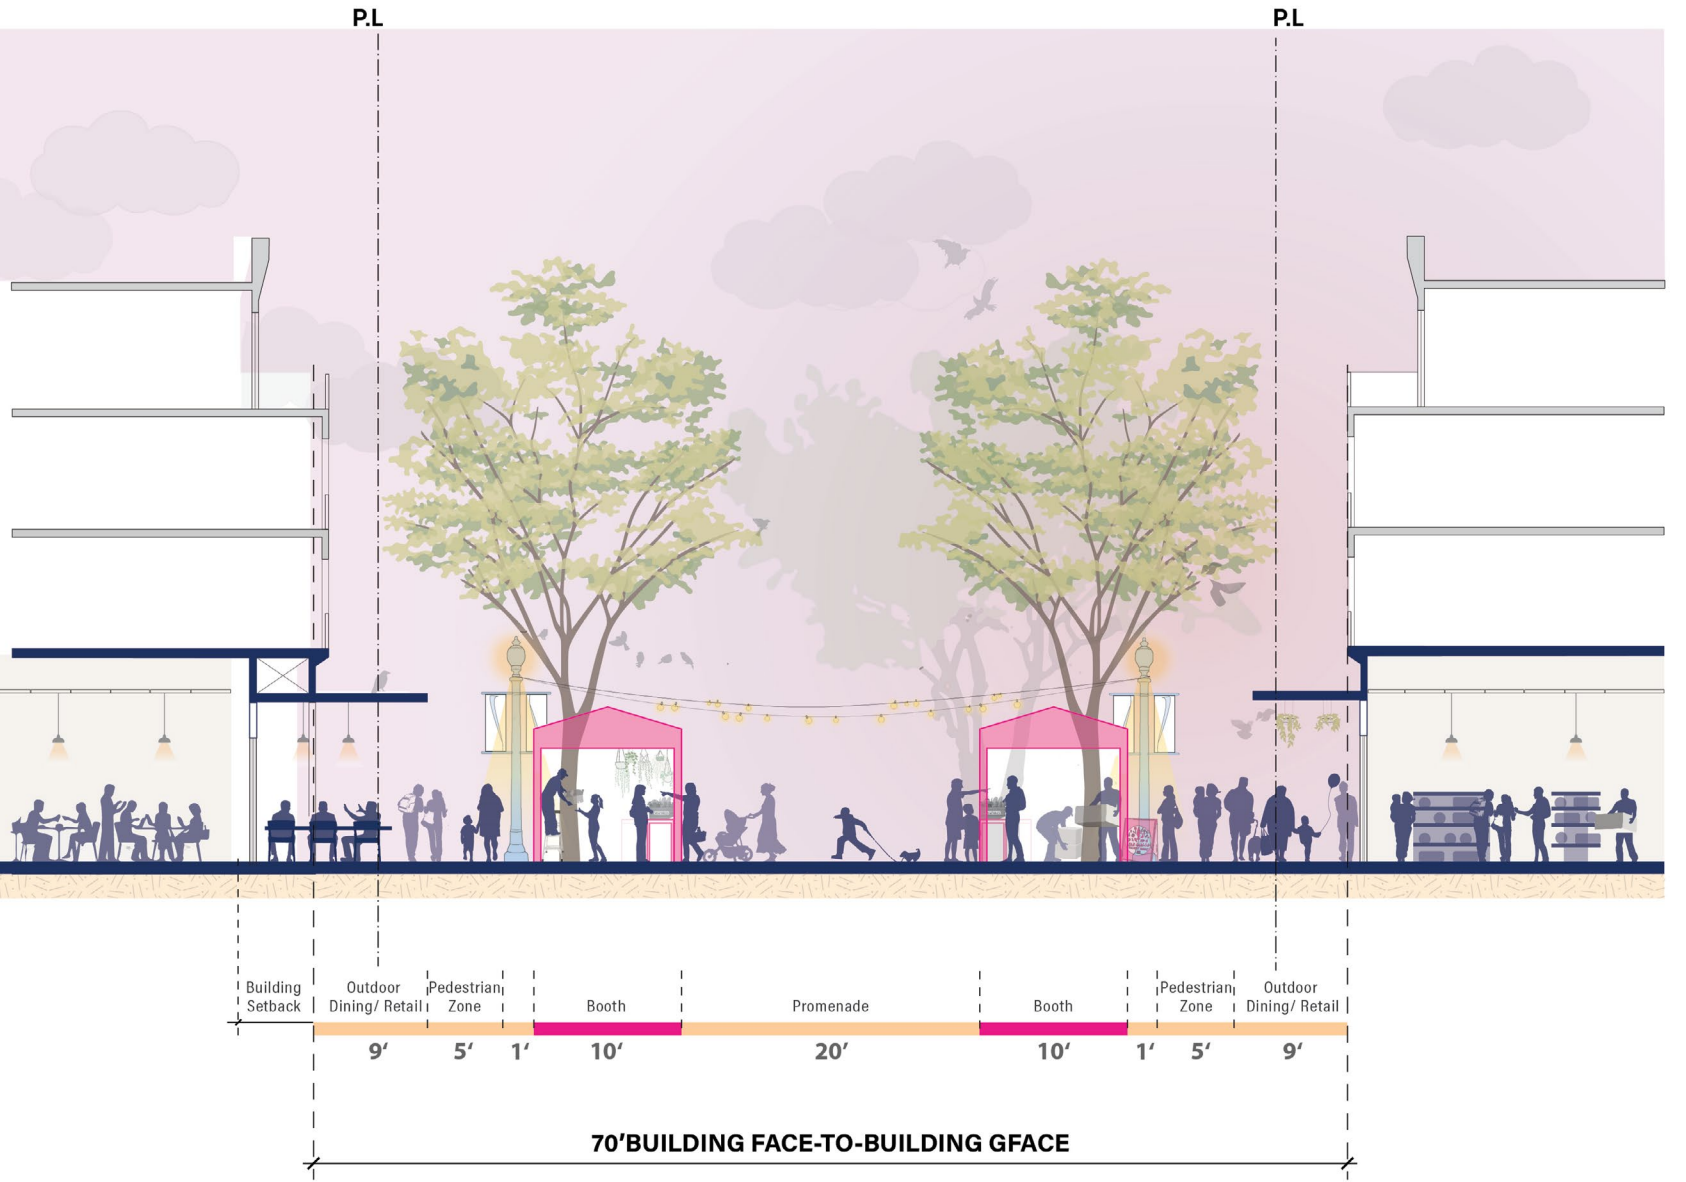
PROPOSED STREET SECTION – 600 & 800 BLOCKS OF LAUREL STREET, FARMERS' MARKET SCENARIO (LOOKING SOUTH)
